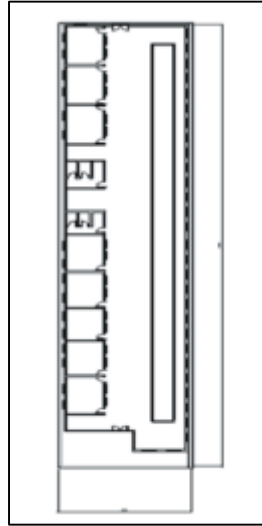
Plan view of the towing tank floor (ground floor) of the CoE
